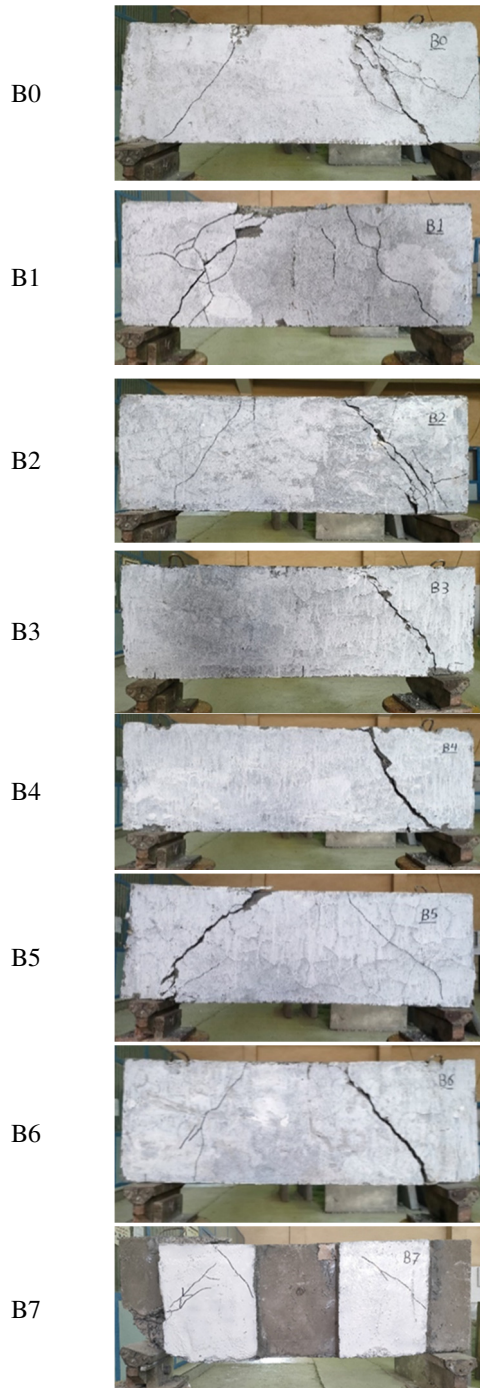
Failure modes and cracking patterns of the tested deep beam specimens.
